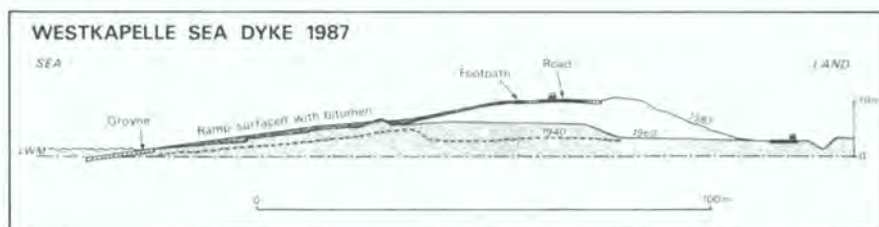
Stages in the enlargement of a Dutch sea wall. In 1940 it was 2.5 metres high and 30 metres wide, and by 1987 it was more than 10 metres high and over 130 metres wide, its seaward slope faced with bitumen.
